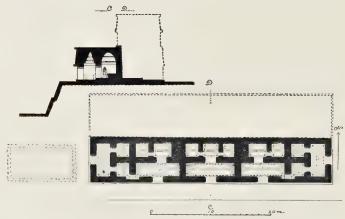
Tikal: Plan and Section of the Palace with Rear Chambers and Great Stone Benches.
